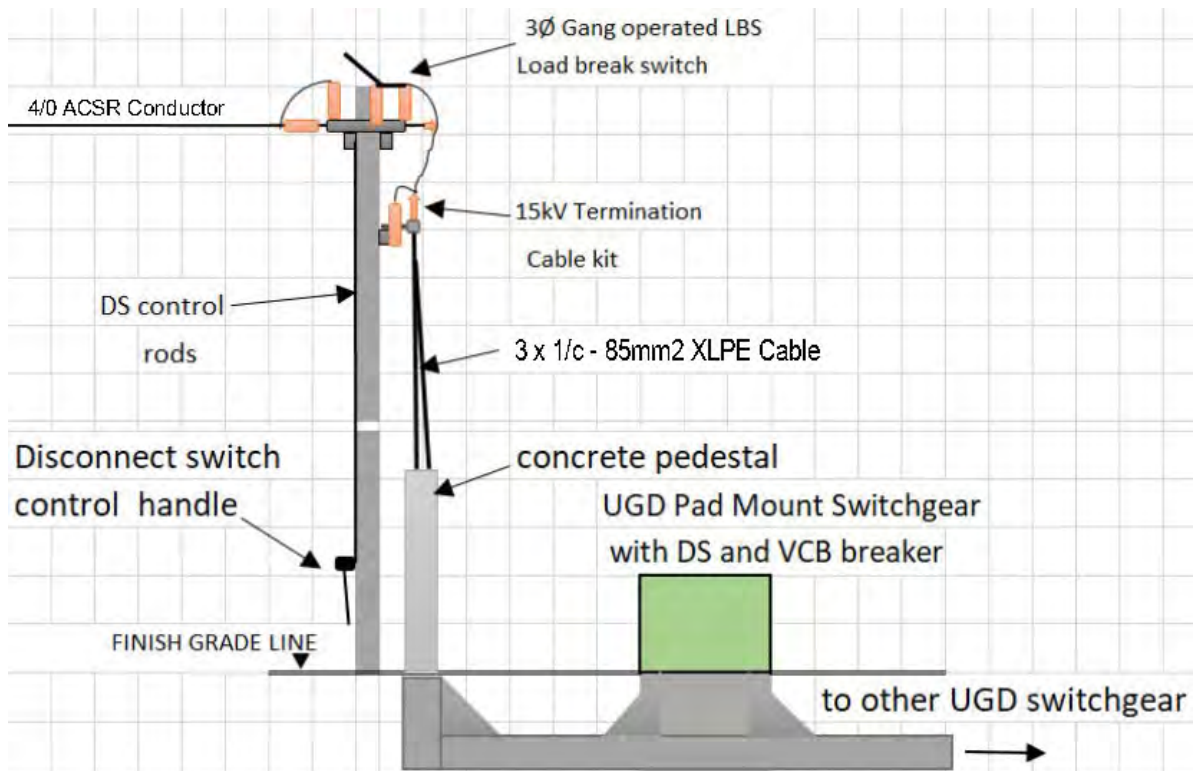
PRIMARY MV, SWITCHGEAR TERMINAL BUSHING
